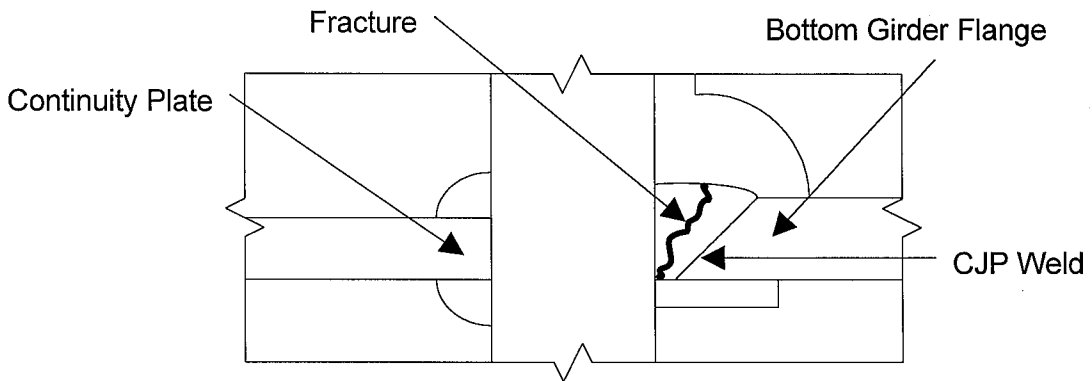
Damage Type W2 (CJP Weld Metal Fracture)
